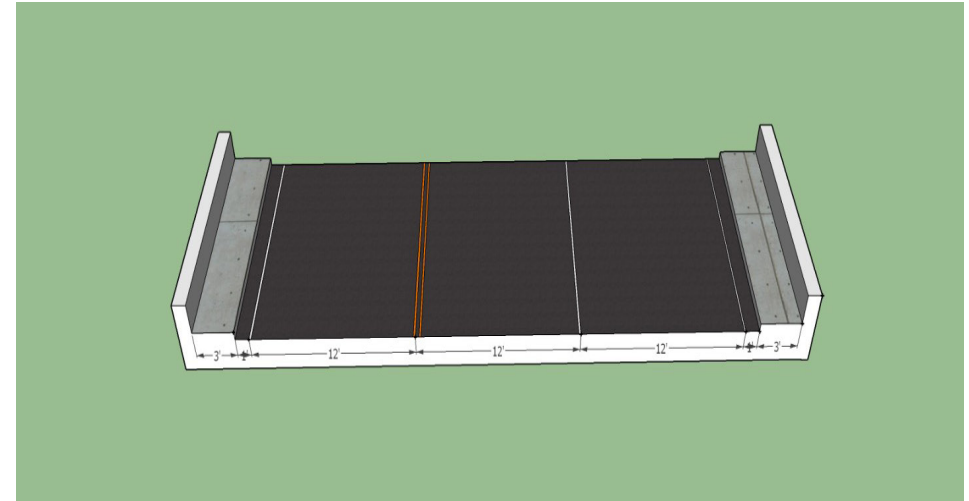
Current design of Bill Kennedy Way bridge over I-20 between Reynoldstown and Glenwood Park
